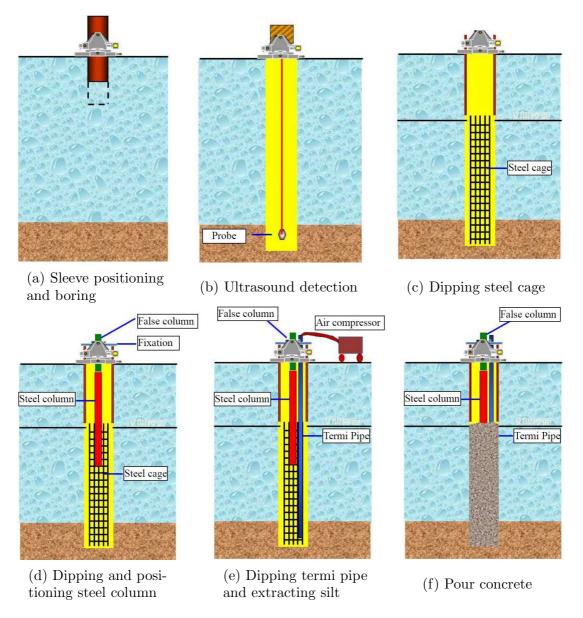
Construction flowchart of steel column for full casting pile foundation
